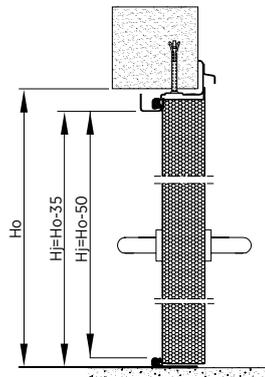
Installation of the single-leaf door with a corner frame without a thermal break to a masonry wall - vertical cross-section
